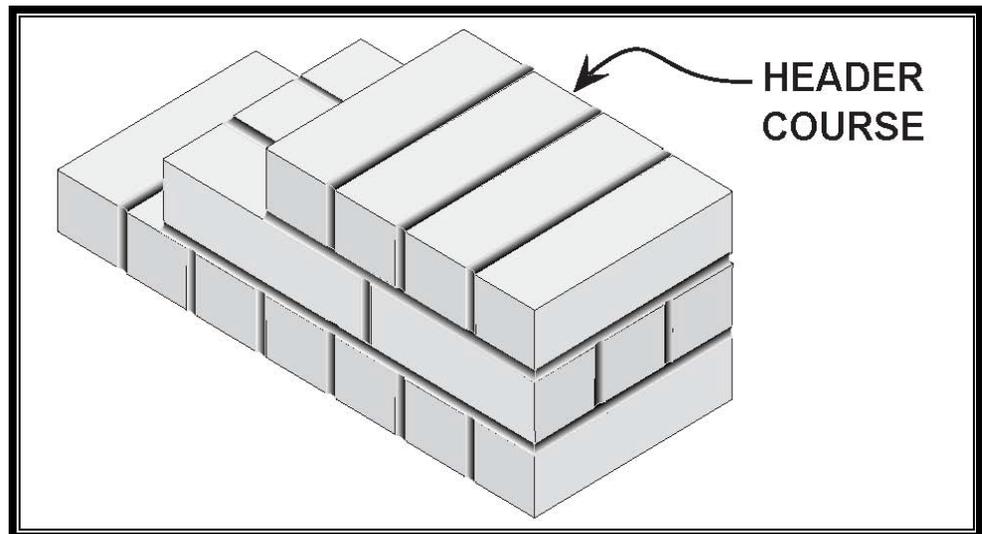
Brick Manhole, Inlet, or Catch Basin
